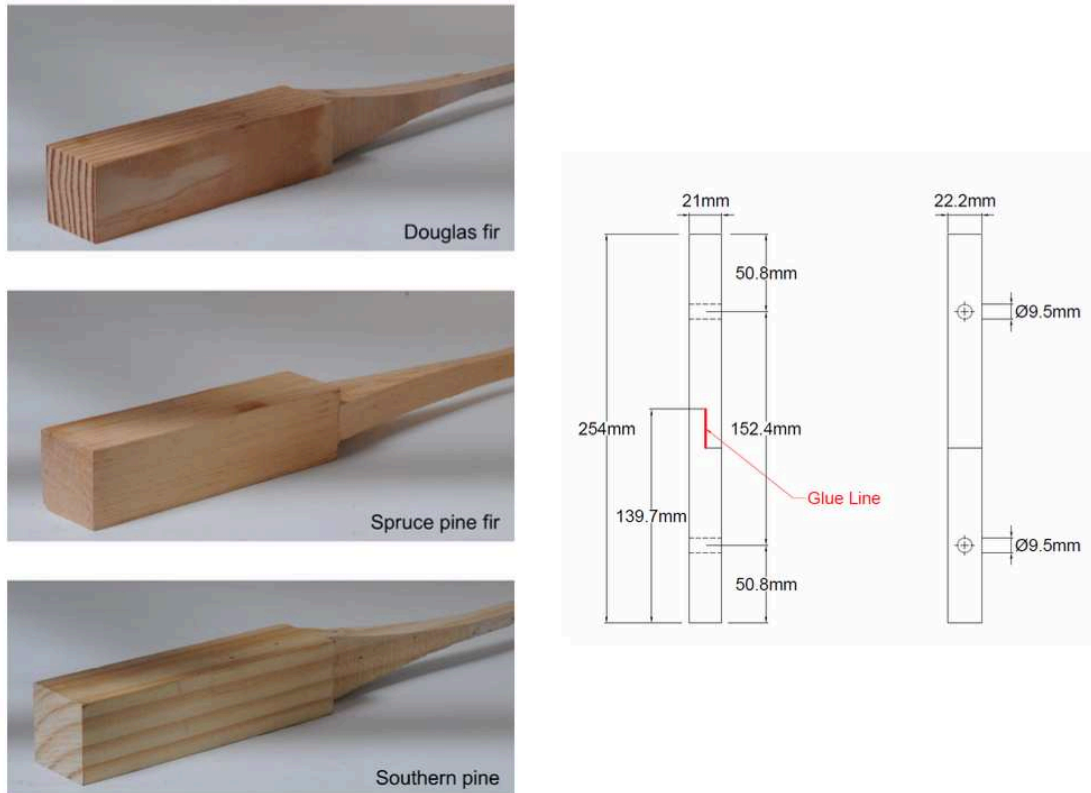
Small-Scale Testing Specimens (Wood and Glue) [8]
